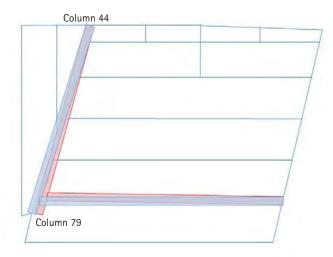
Girder 44-79 Impact Overlap Plan Diagram (position of intact girder below show in blue; position of rotated girder at impact shown in red)
